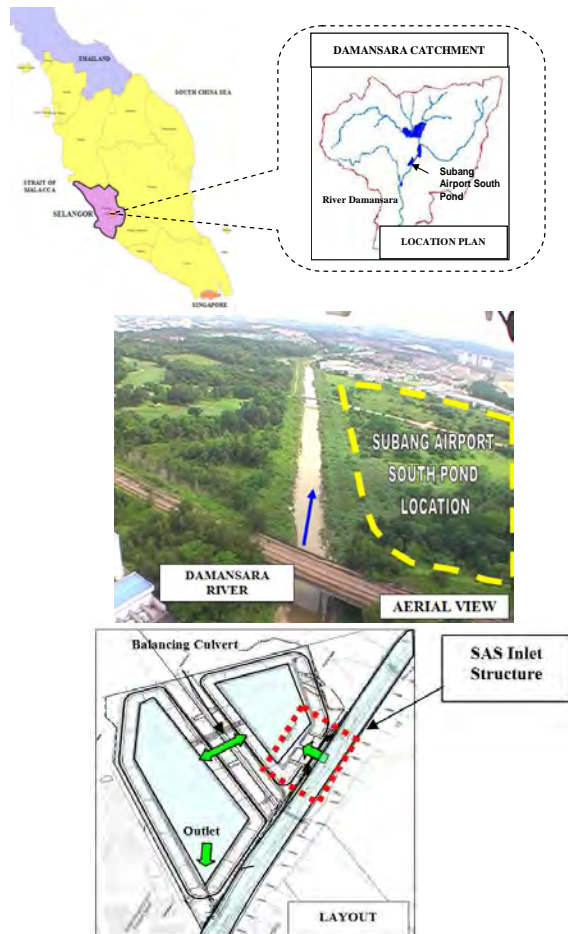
Location, Layout Plan and Aerial View of Proposed Subang Airport South Pond
